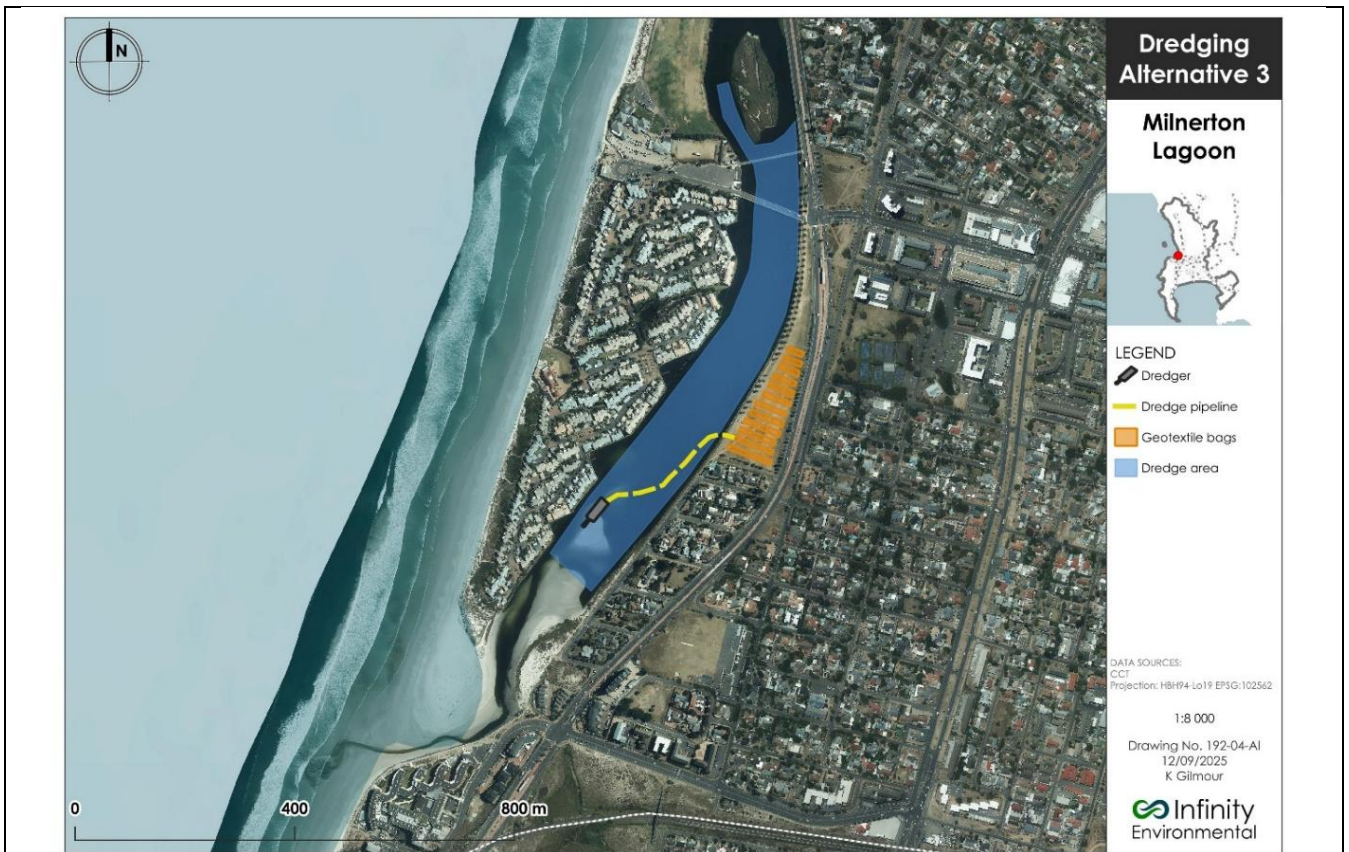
This schematic presents the design and layout Alternative 3 – the proposed ‘full’ dredging with off-site disposal.
